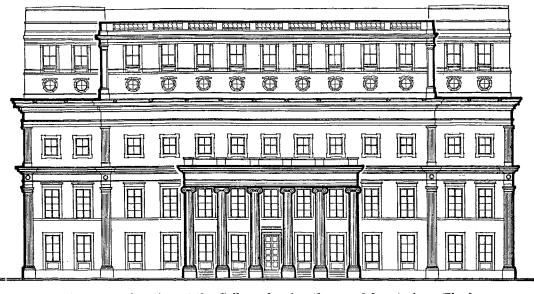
Front elevation of the College showing the new laboratories. The heavy outline encloses the original building.
